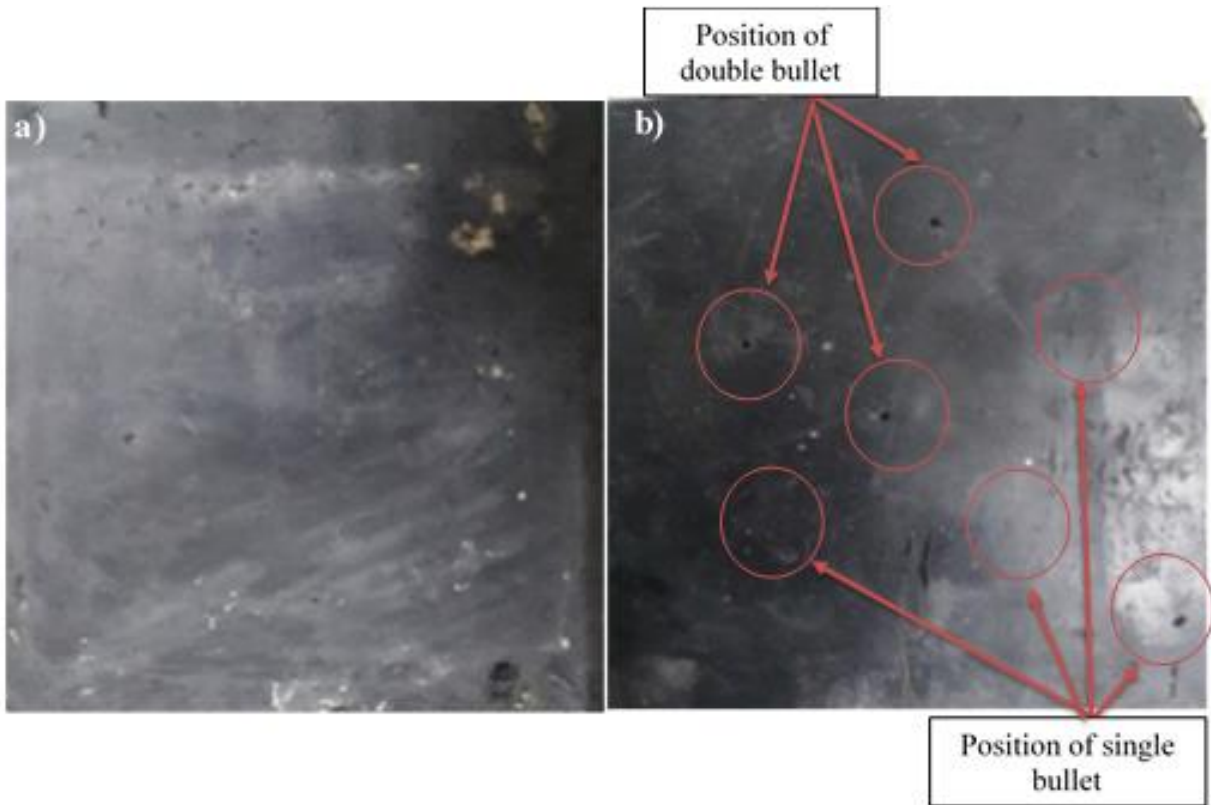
The plate after test a) backside of the plate, b) front side of the plate.
